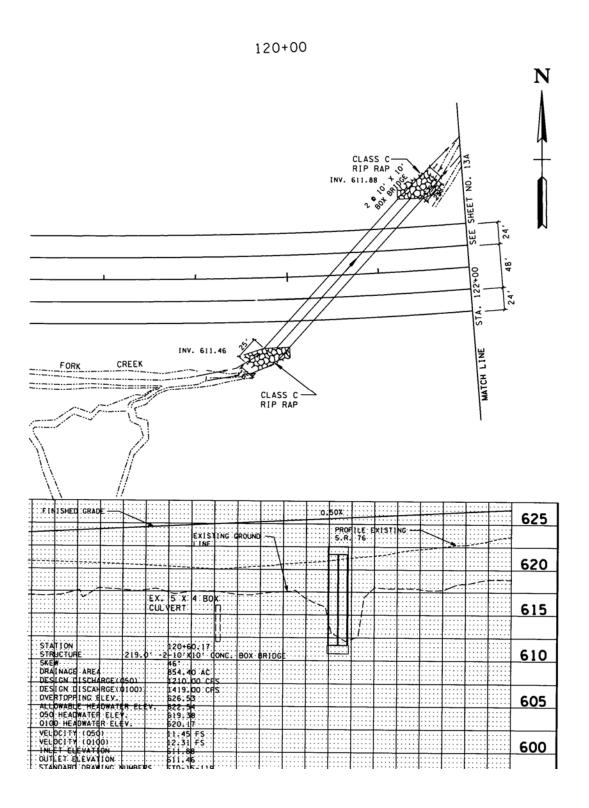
A-8. Portion of Proposed Layout Sheet (Box Bridge)
